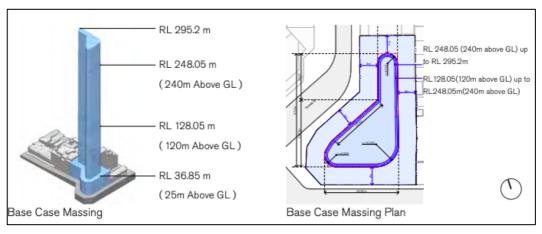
Base Case Envelope for 187 Thomas Street Viewed Looking North East Source: fjmt
